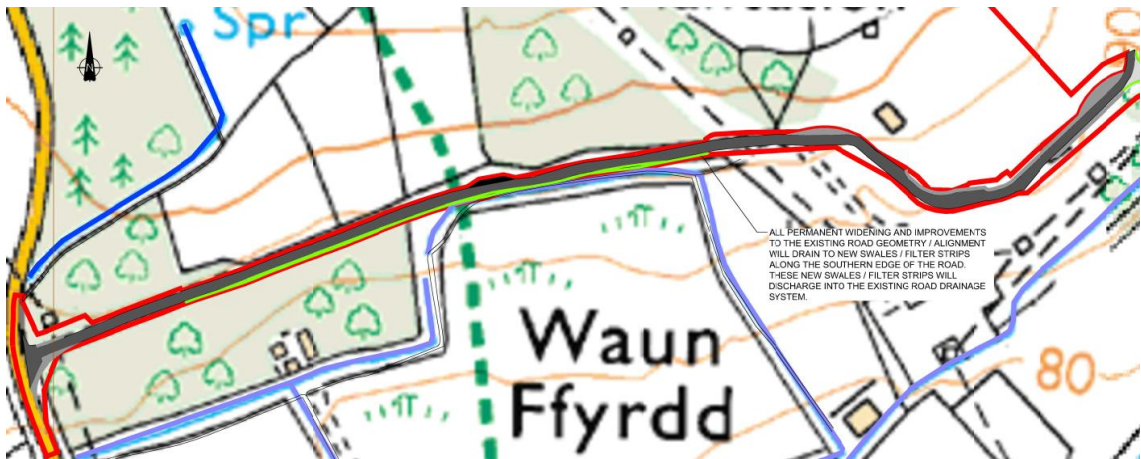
Plan showing nearby drains and watercourse to the site (West section)
